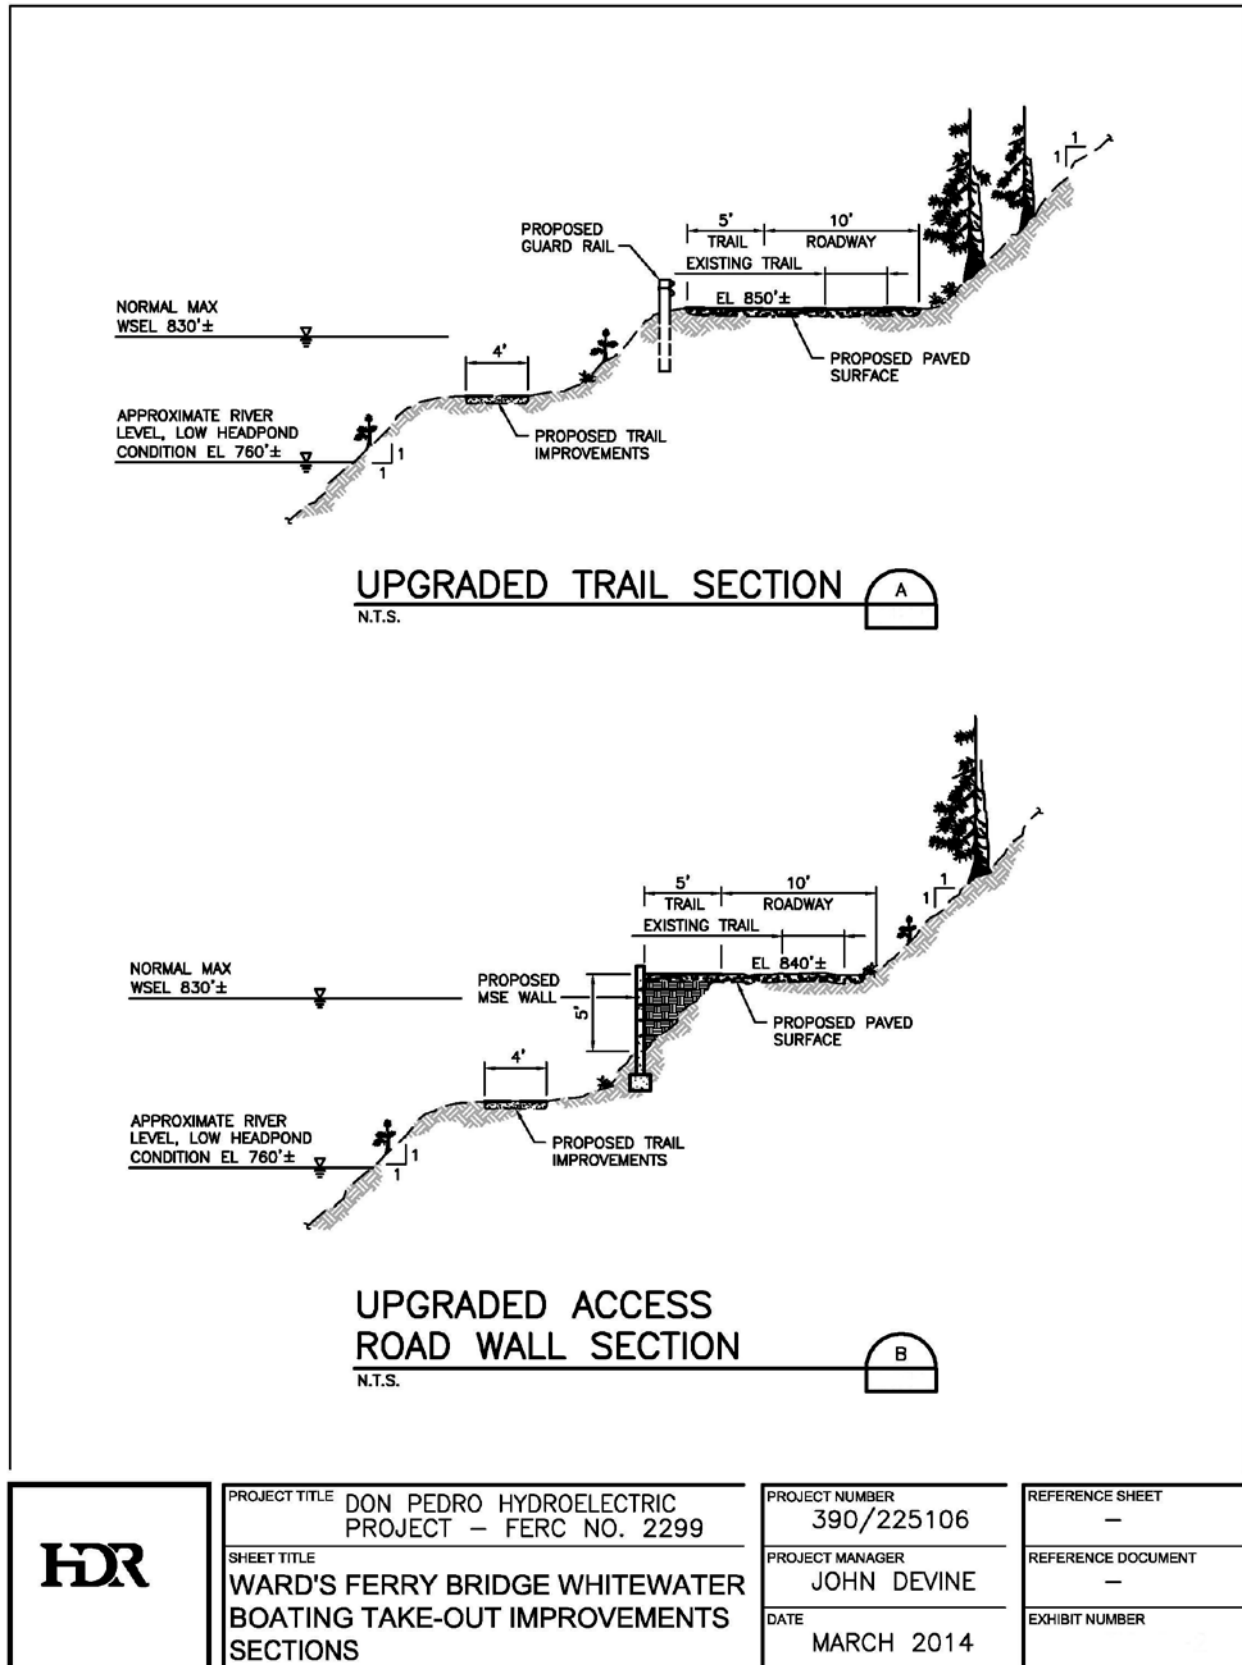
Ward's Ferry bridge whitewater boating take-out improvements -- sections.
